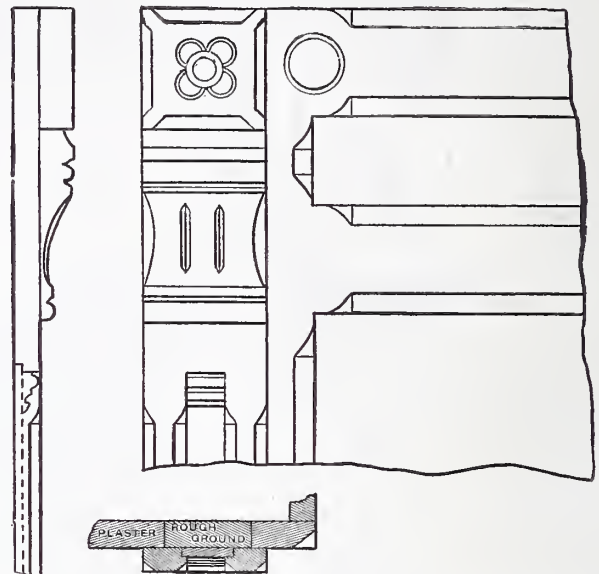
General Detail of Doors—Scale, $1\frac{1}{2}$ inches to 1 foot.
